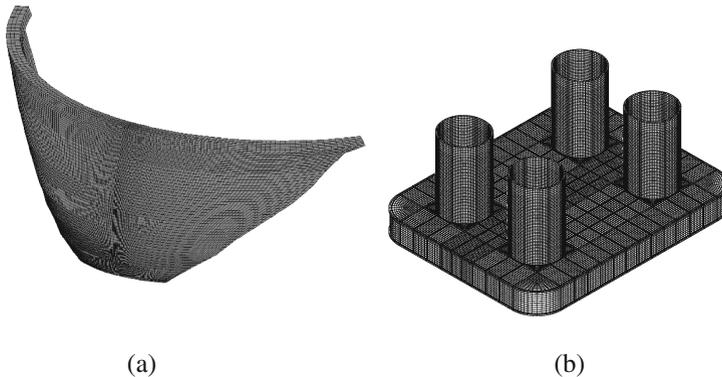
Examples of large concrete shell structures (Multiconsult ASA). (a) Dam Sarvsfossen, (b) Offshore concrete structure.
